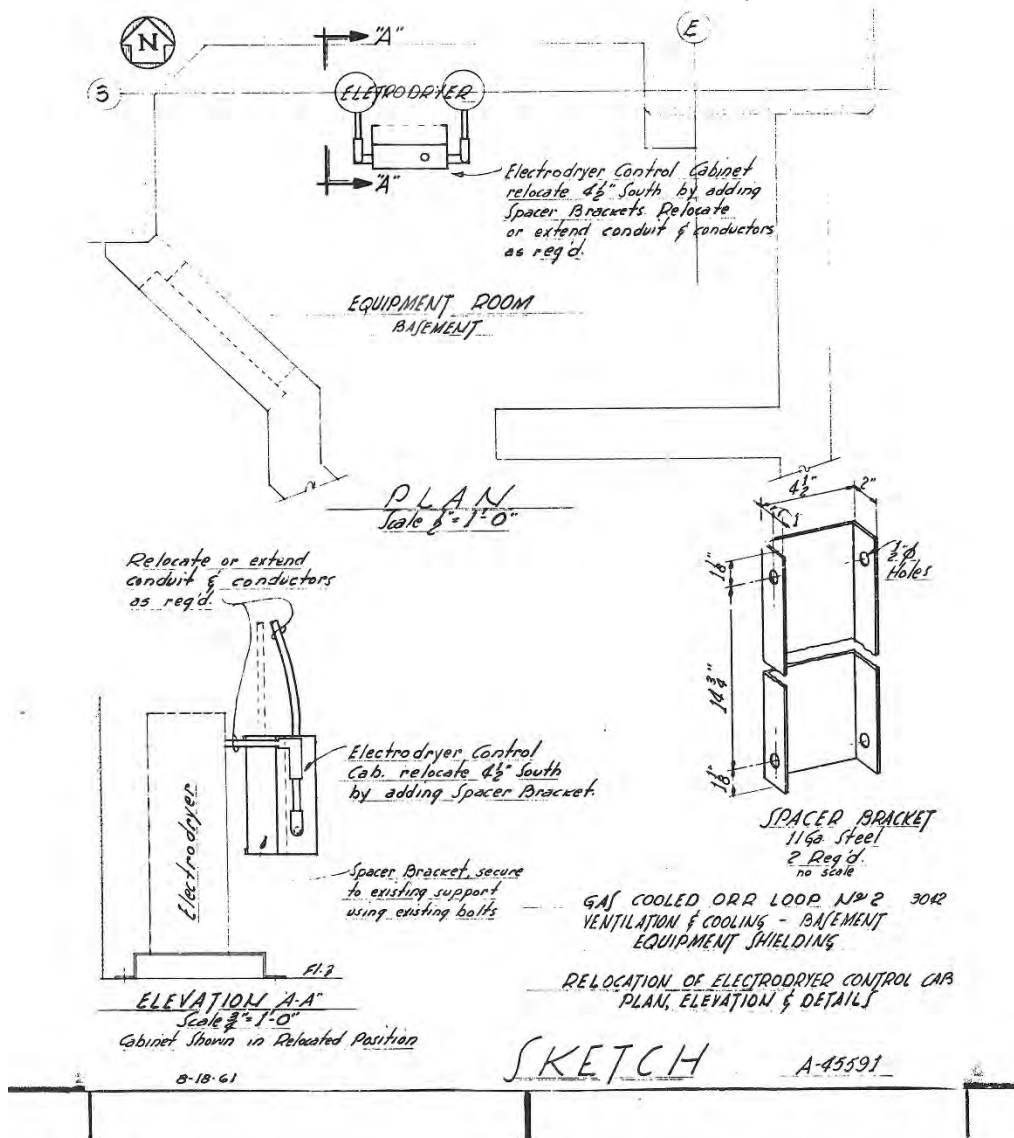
Plan for the relocation of the electrodryer control cabinet at Building 3042 (Oak Ridge National Laboratory, August 18, 1961).
